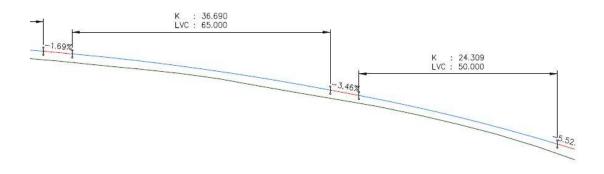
Vertical profile of corrugated pavement section (36+300 km)
